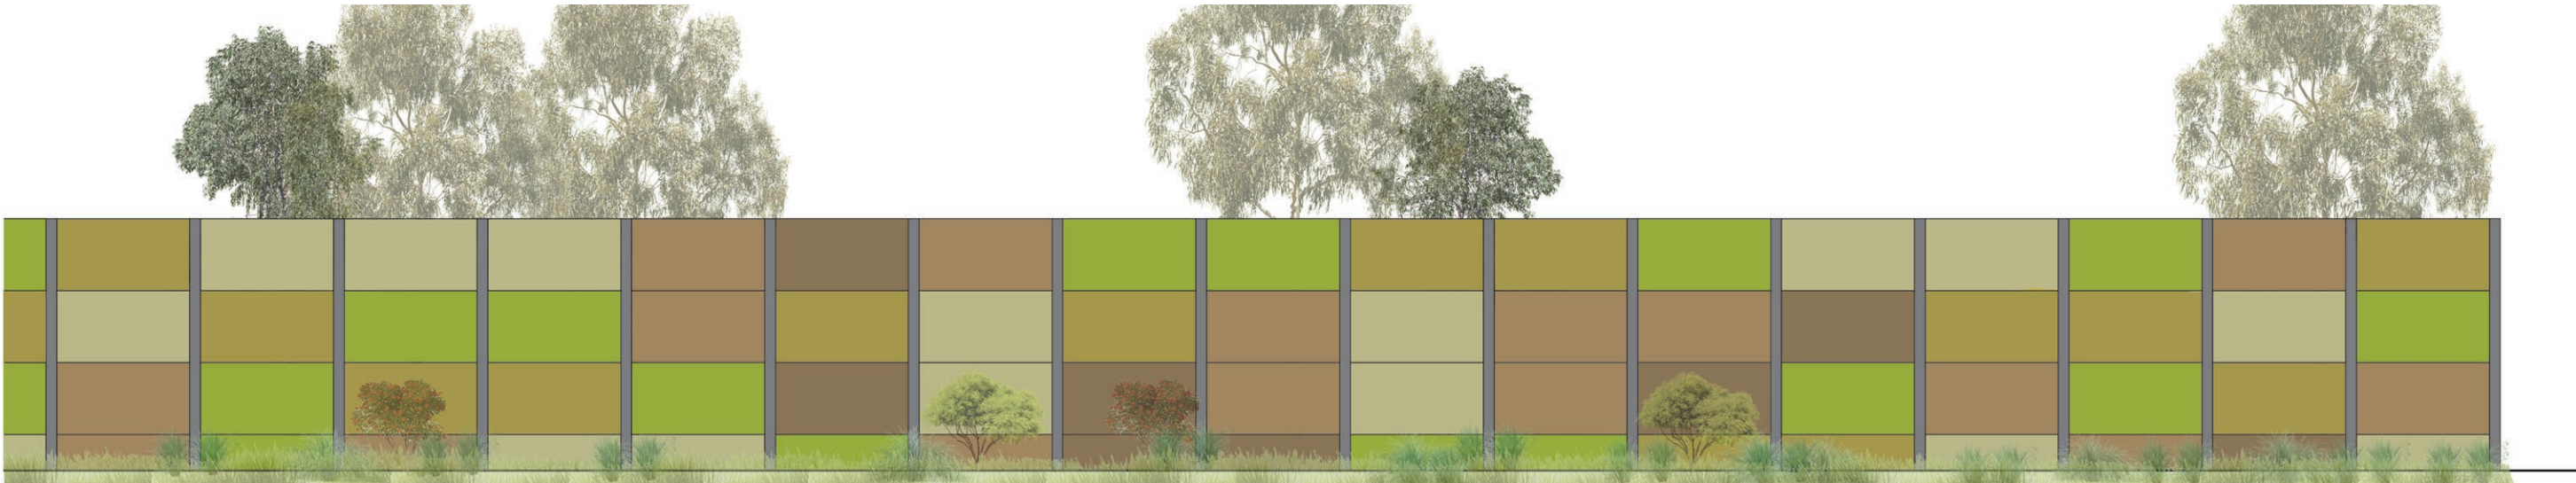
Indicative Elevation and Detailed Profile of Noise Wall Type 3
